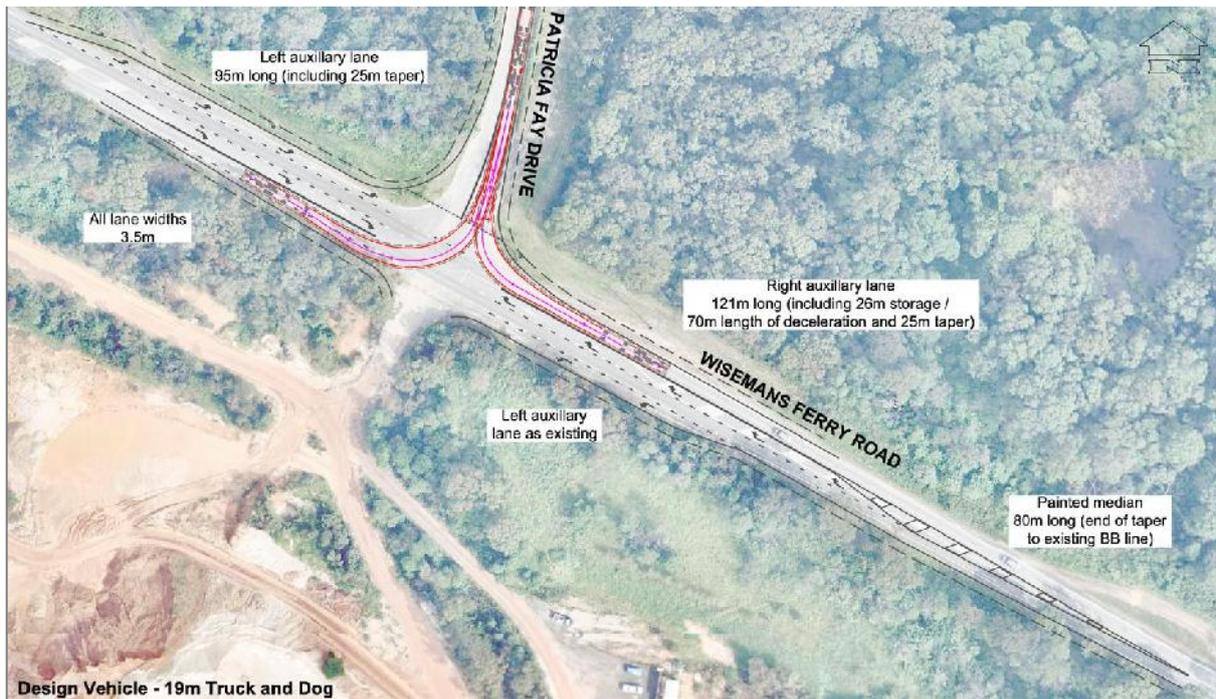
Concept Plans of Proposed Intersection Upgrade Works Exit Turn Paths (Source: Transport & Urban Planning, 2020)
